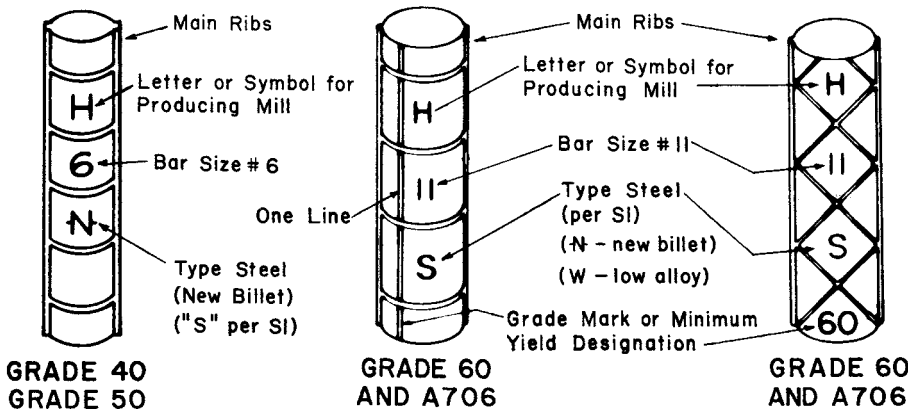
Reinforcing bars are manufactured with identification marks, denoting the mill that produced the bars, bar size, type of steel, and steel grade. Steel grade is indicated either with a number, such as 60 for Grade 60 steel, or with short bars (grade lines), in which no bars indicates Grade 40 or 50 steel, one bar indicates Grade 60 steel, and two bars indicates grade 75 steel. (Courtesy of Concrete Reinforcing Steel Institute)
